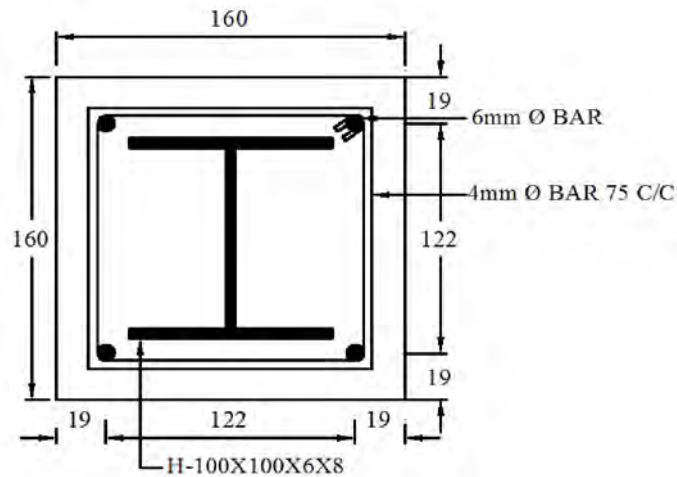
Typical cross section of FEC columns (Matsui 1979)
